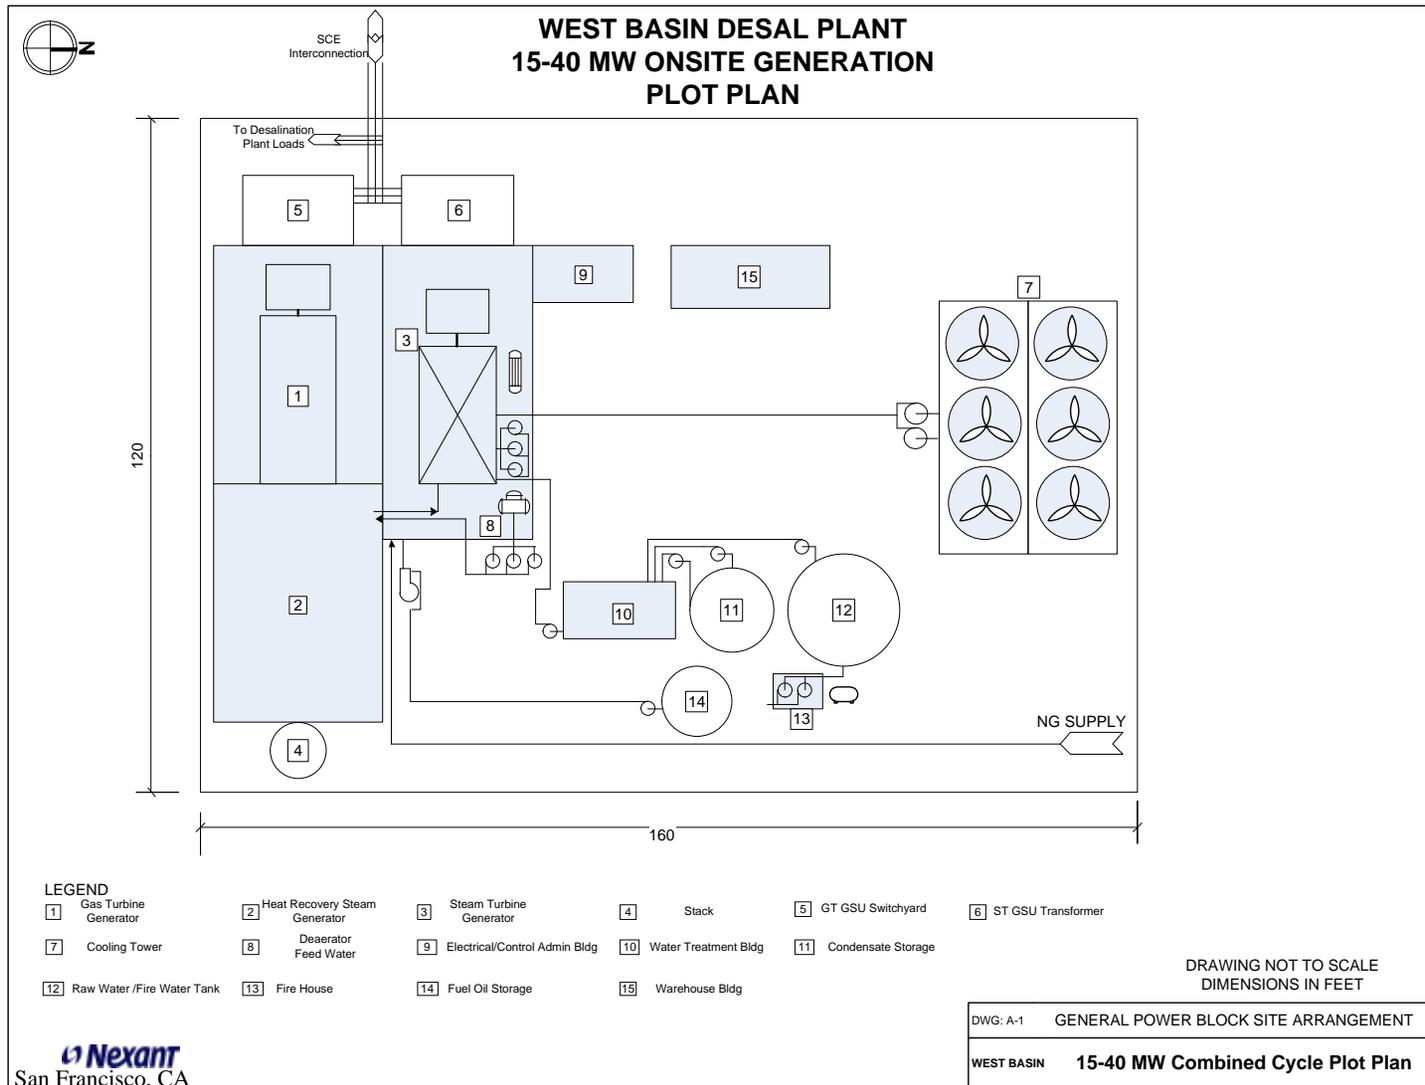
Typical Layout and Footprint for Combined Cycle Plan
